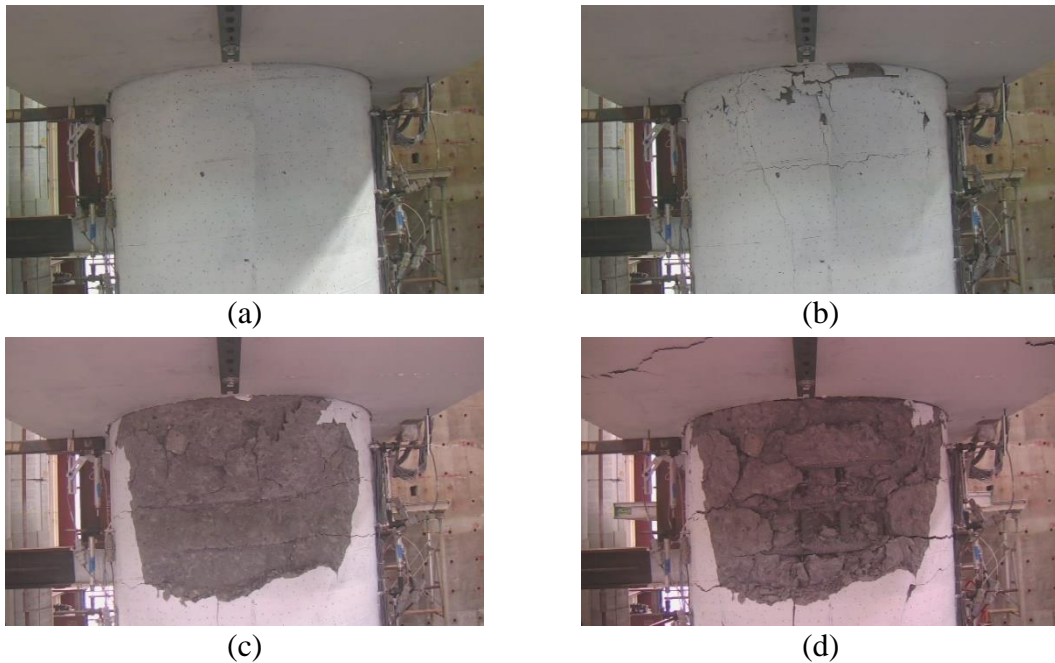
South Face of Column Plastic Hinge at Key Points During Test: (a) Concrete Flaking; (b) Onset of Concrete Spalling; (c) Severe Concrete Spalling; (d) Reinforcing Bars Exposed
